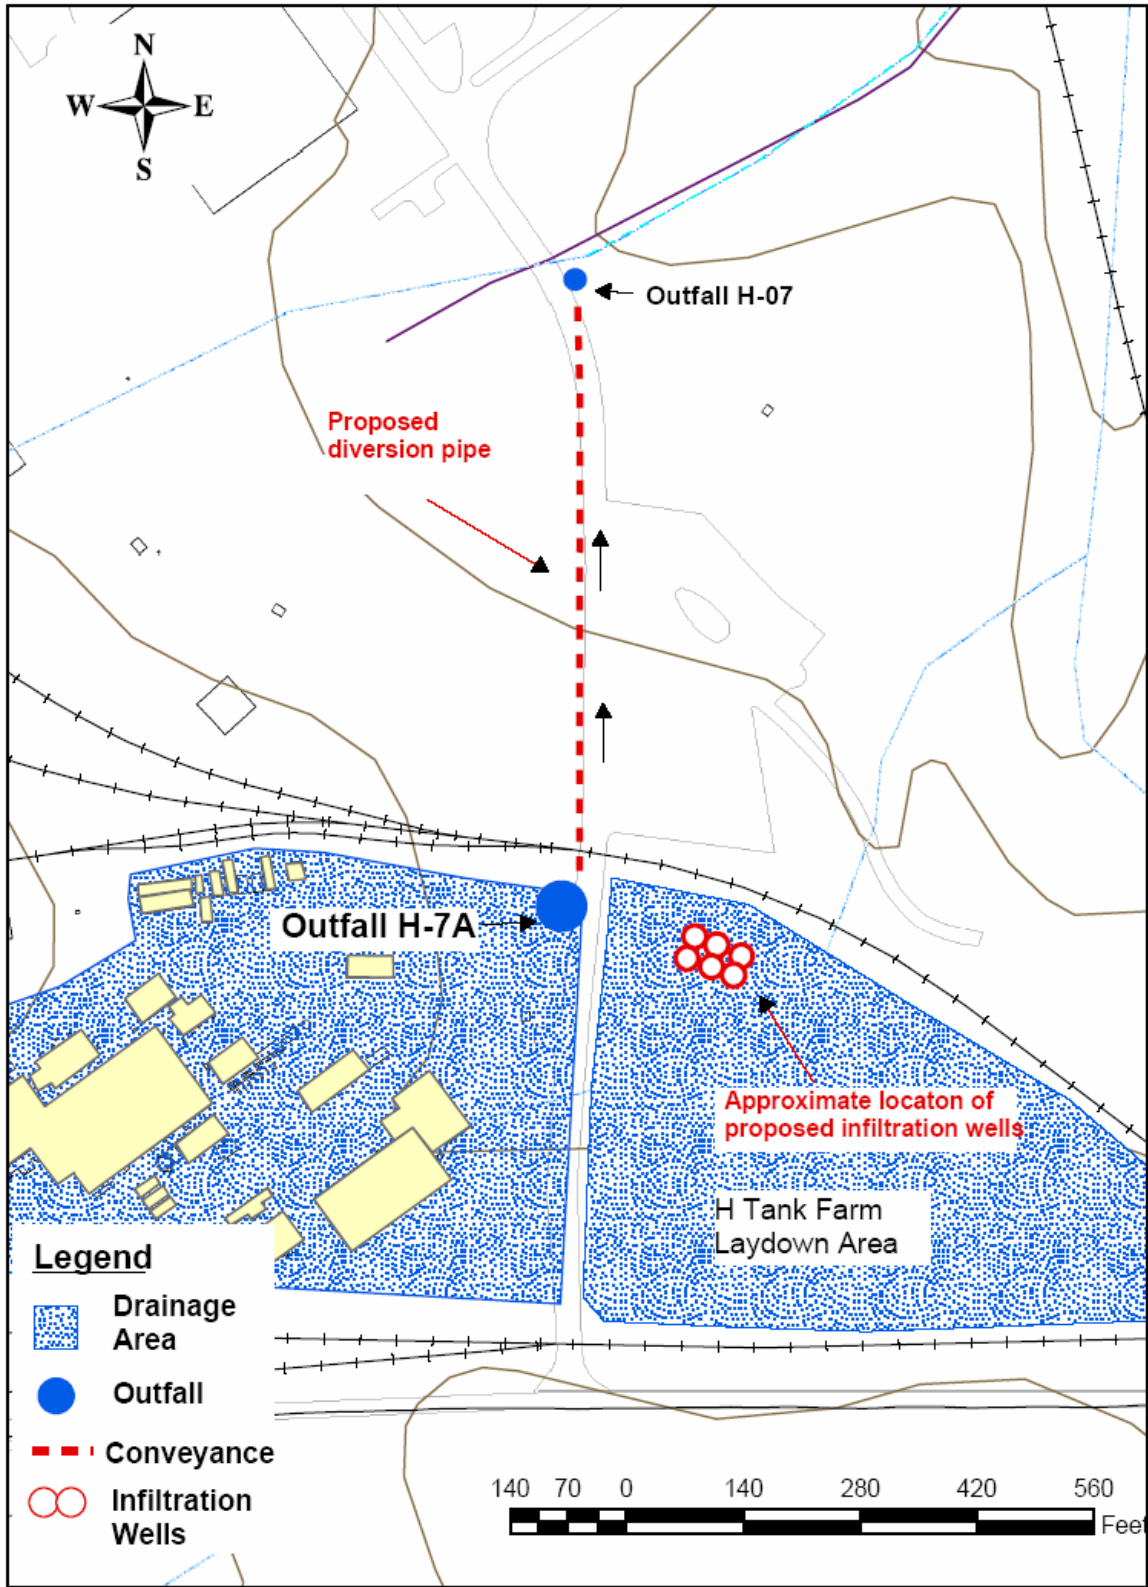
Outfall H-7A, Option C: Diversion of Flow to Outfall H-07 and Install Infiltration Wells for Laydown Yard Drainage.
